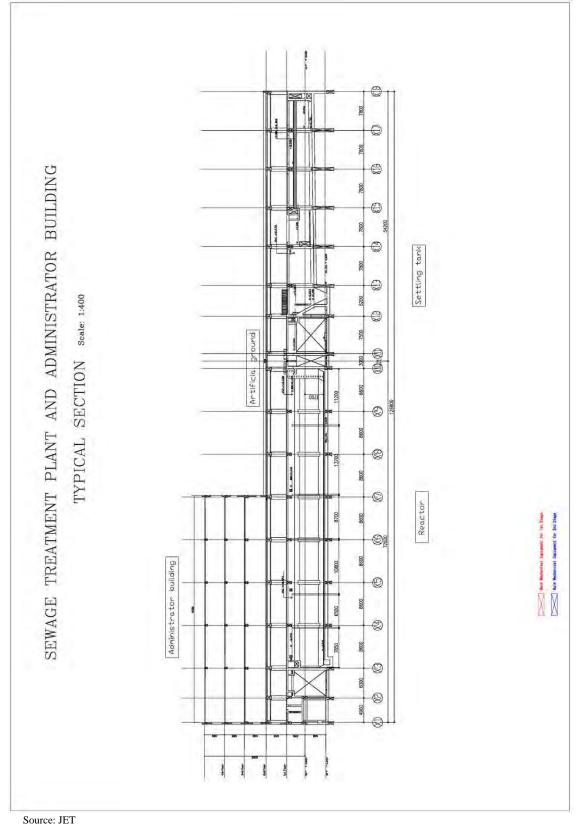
Sewage Treatment Plant and Administration Building Typical Section
